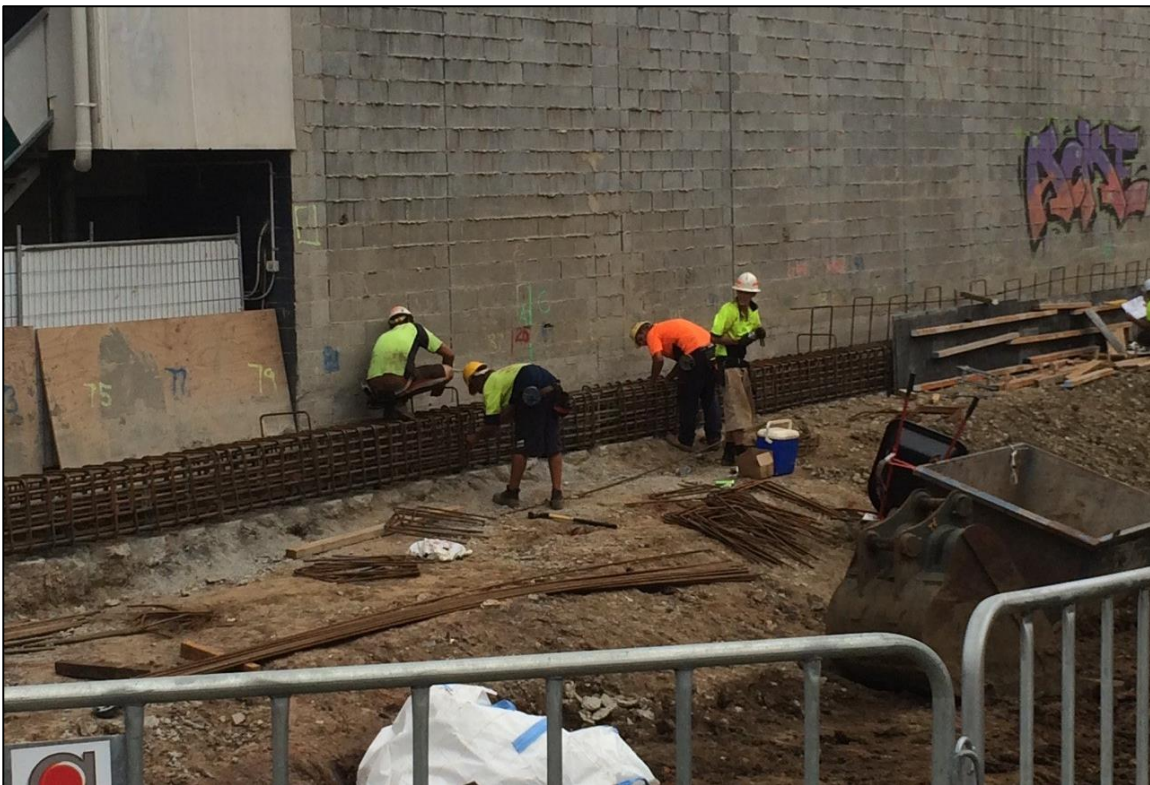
Workers are preparing steel reinforcing to support the capping beam.
